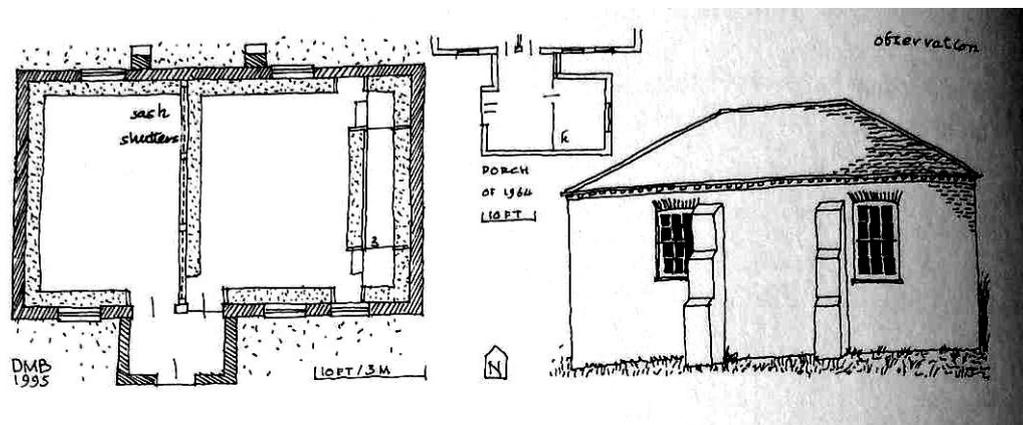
Plan and elevation, from Butler, 1990, p. 24
